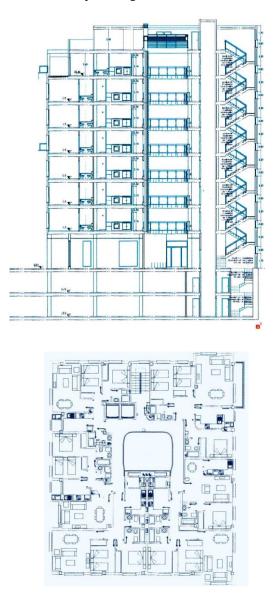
Figure 5: Perspective, floor plans and sections of 159 residences, retail spaces, parking garages and storage units
